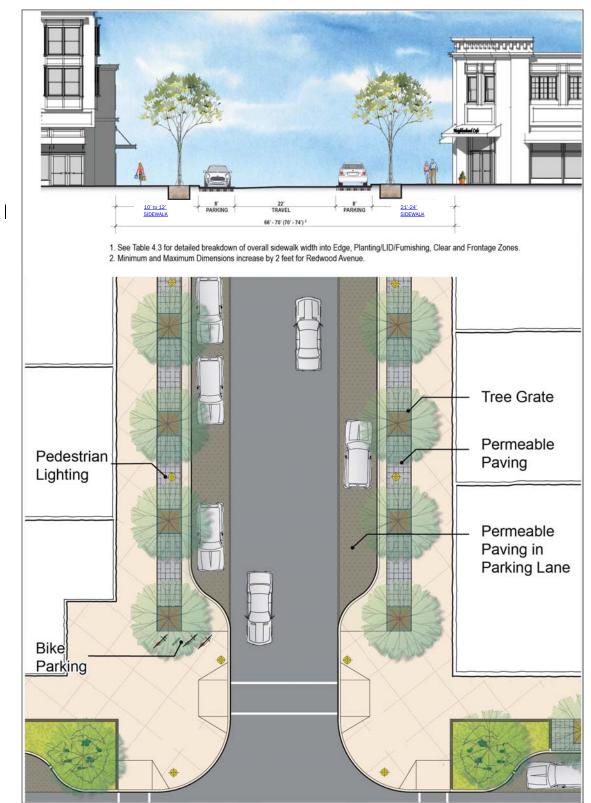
B MIXED USE STREET/REDWOOD AVENUE² – ALTERNATIVE 2 (TREE WELLS ONLY)
